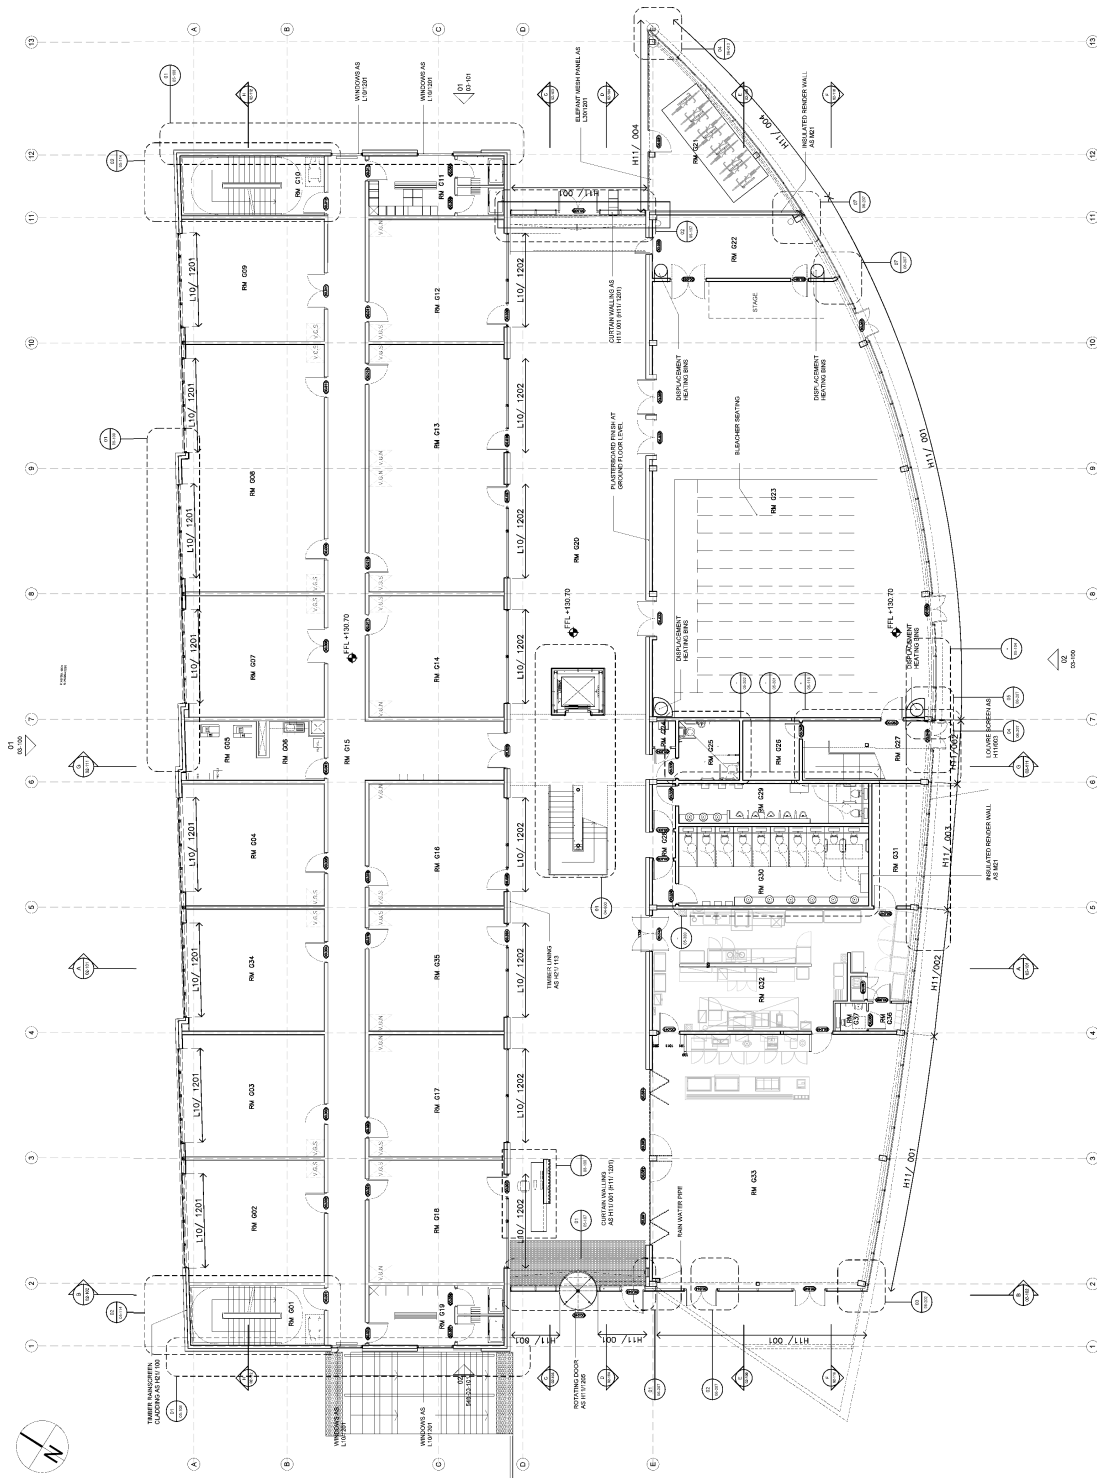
Ground Floor Plan (Consarc, 2011)
